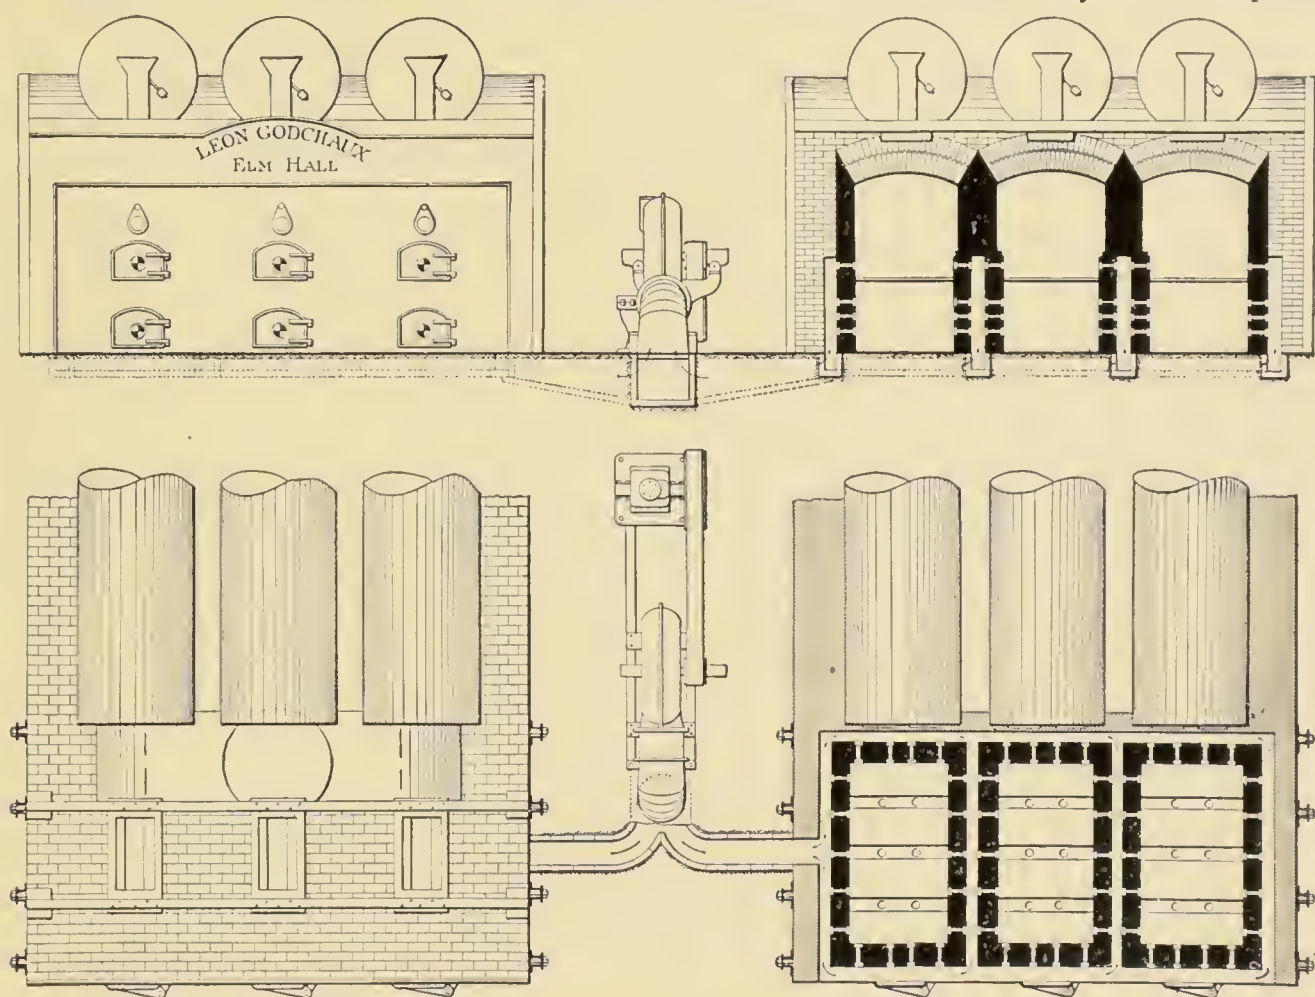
ARRANGEMENT OF HAUBTMAN & LOEB'S BAGASSE BURNERS WITH STURTEVANT FAN AT ELM HALL PLANTATION, LA.
